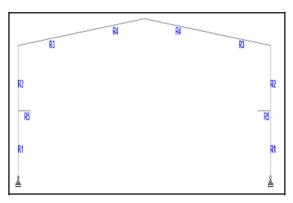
Typical Section OF aluminum- AISC/LRFD Frame
